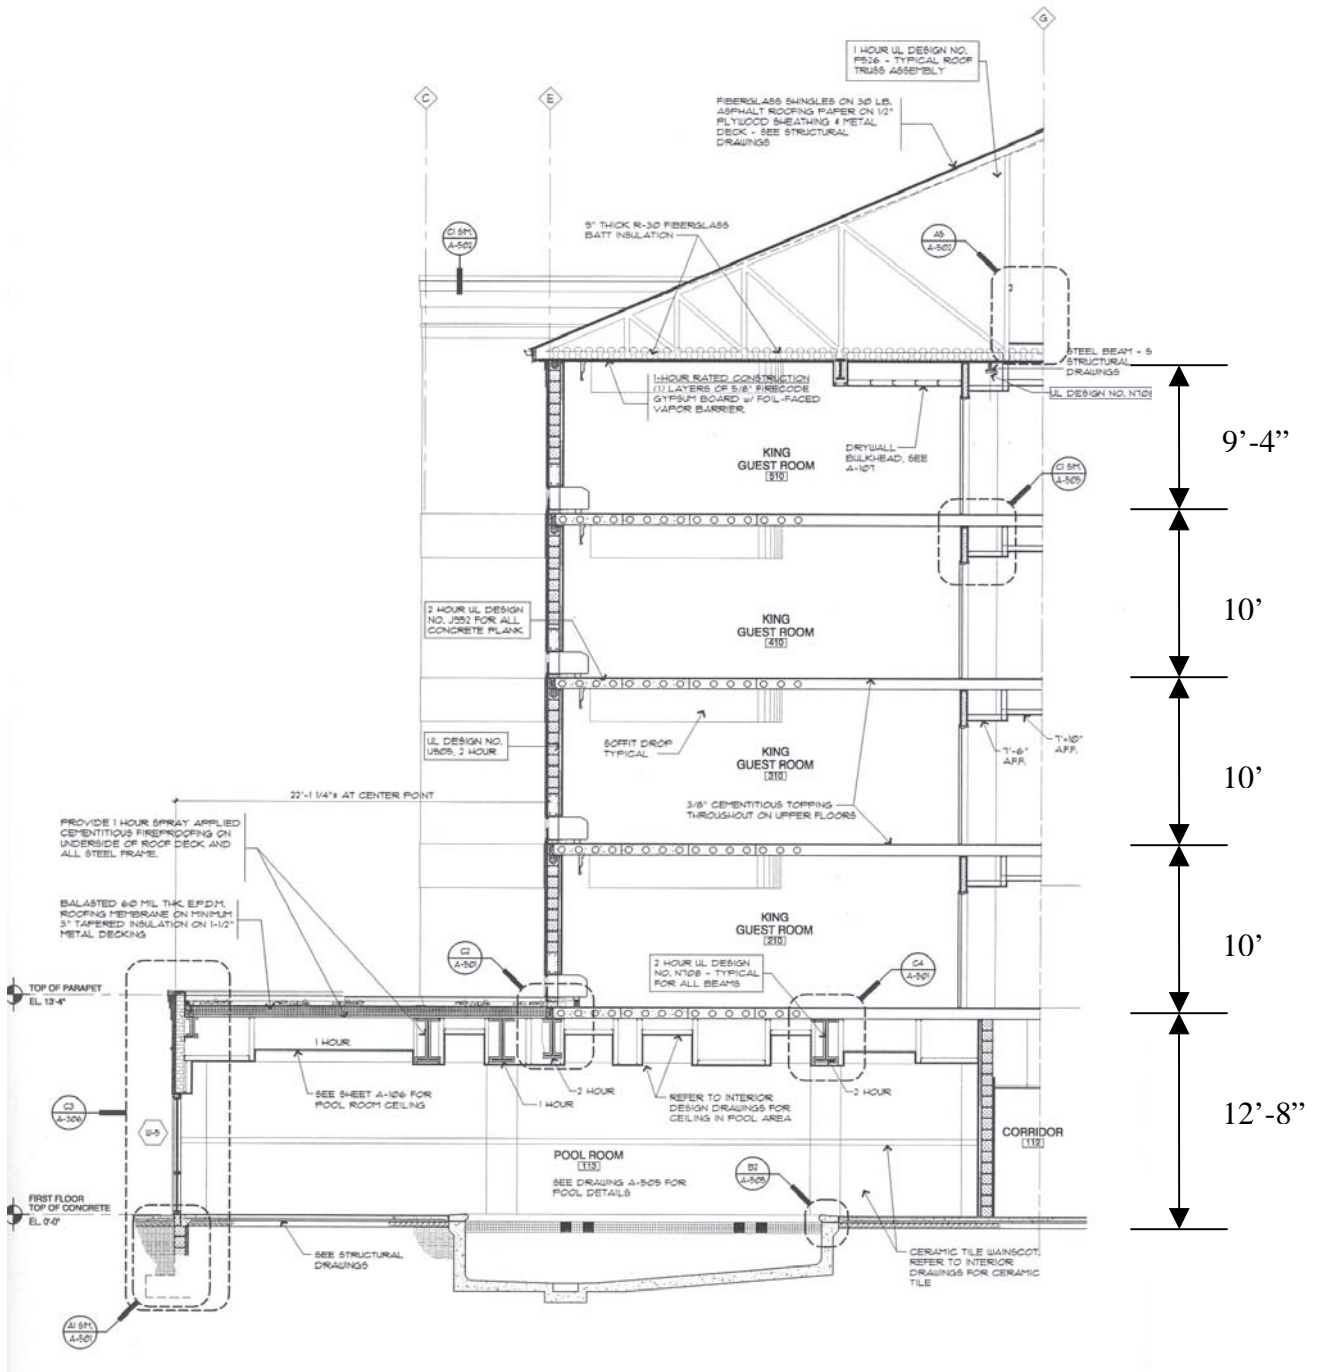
Building section courtesy of Greenfield Architects with existing floor - to - floor heights shown
